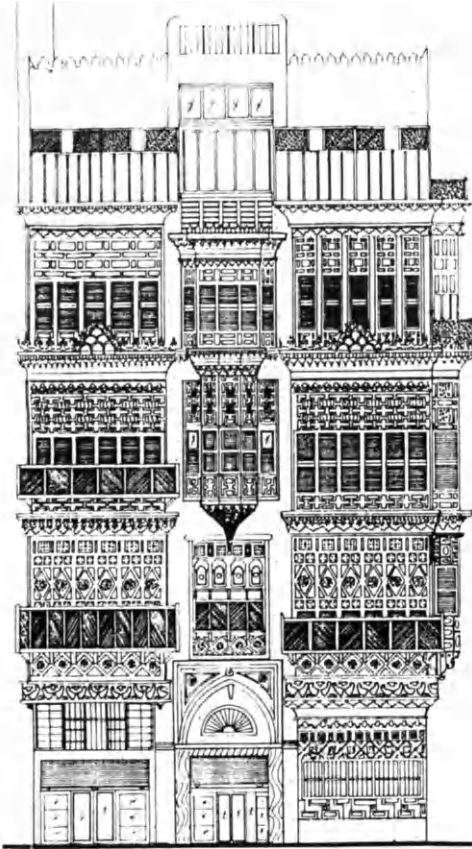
Nour Wali House front elevation facing  $320^{\circ}$  Az from north.
